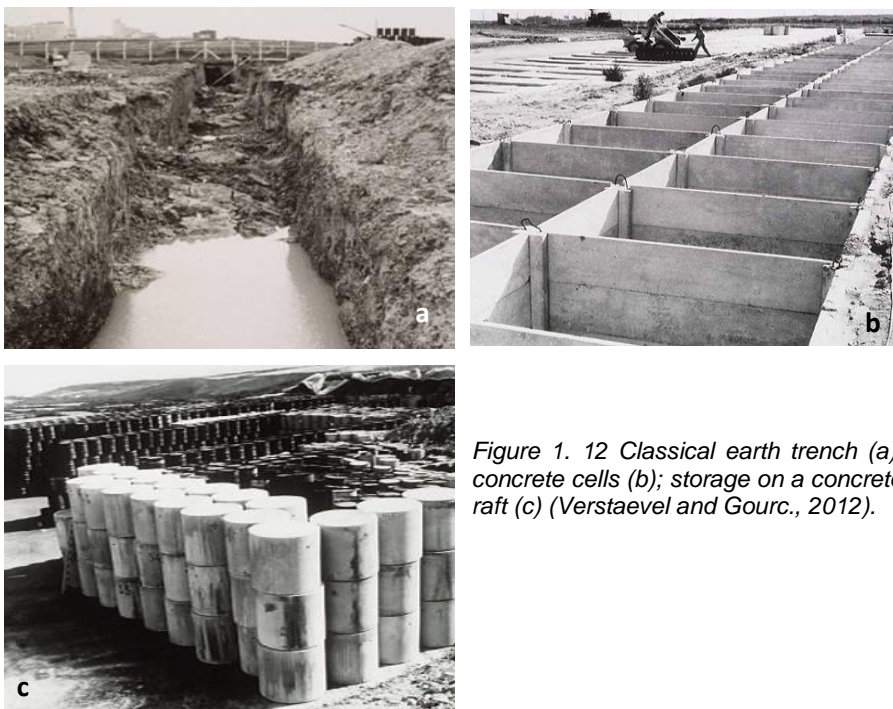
12 Classical earth trench (a); concrete cells (b); storage on a concrete raft (c) (Verstaevel and Gourc., 2012).
